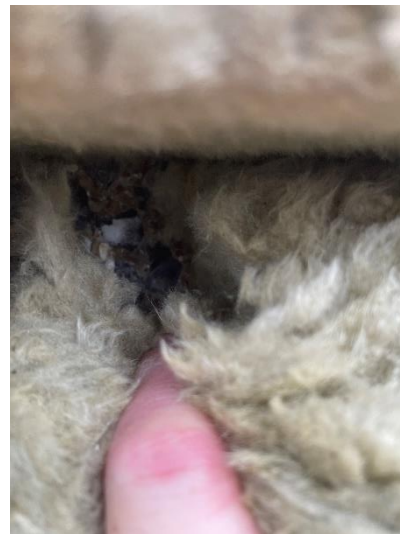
Location 1.2 – Rough stone cladding behind insulation
